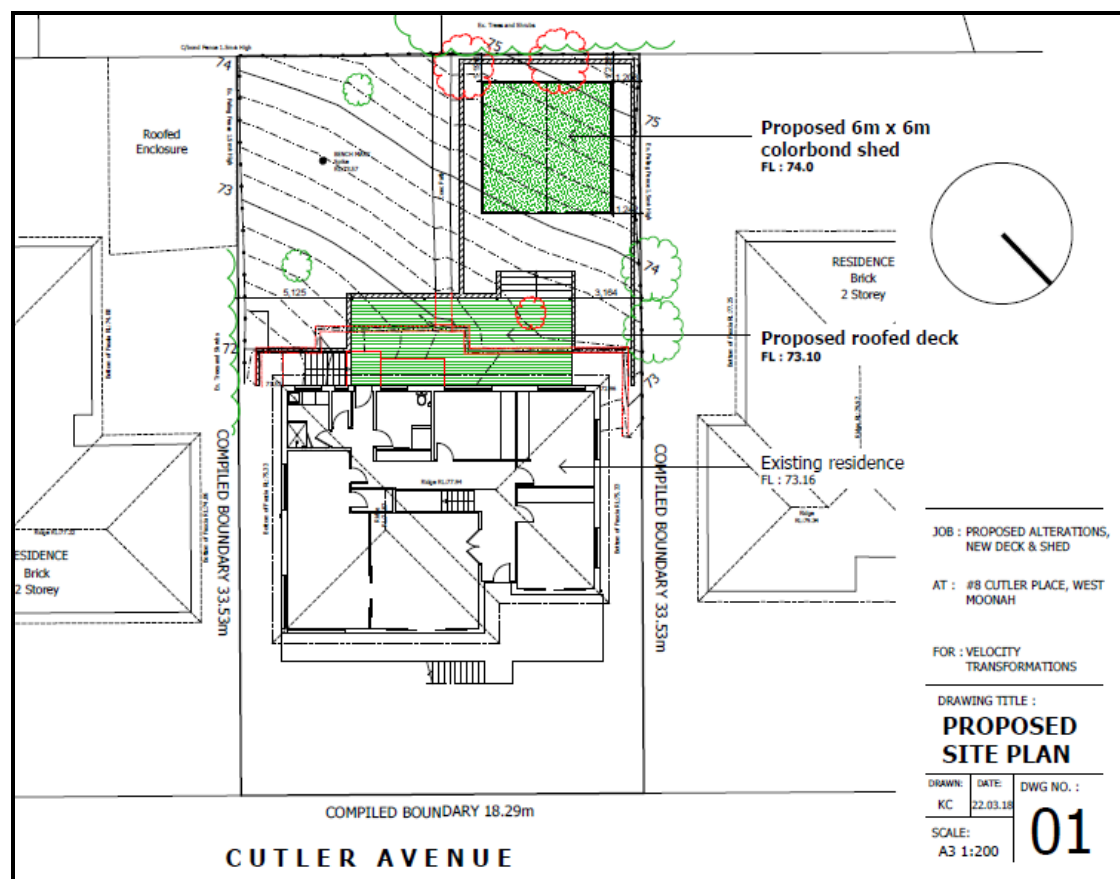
A site plan showing the proposed covered deck to the rear of the dwelling, the shed and retaining walls.
